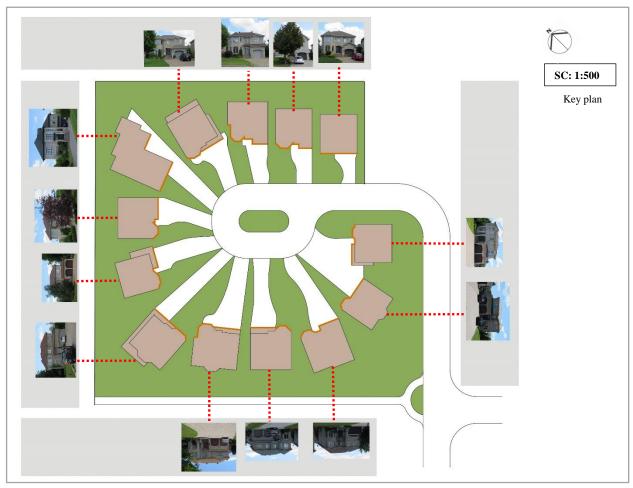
Cul-de-sac Rue Du Collège-Beaubois, Façade, key plan
